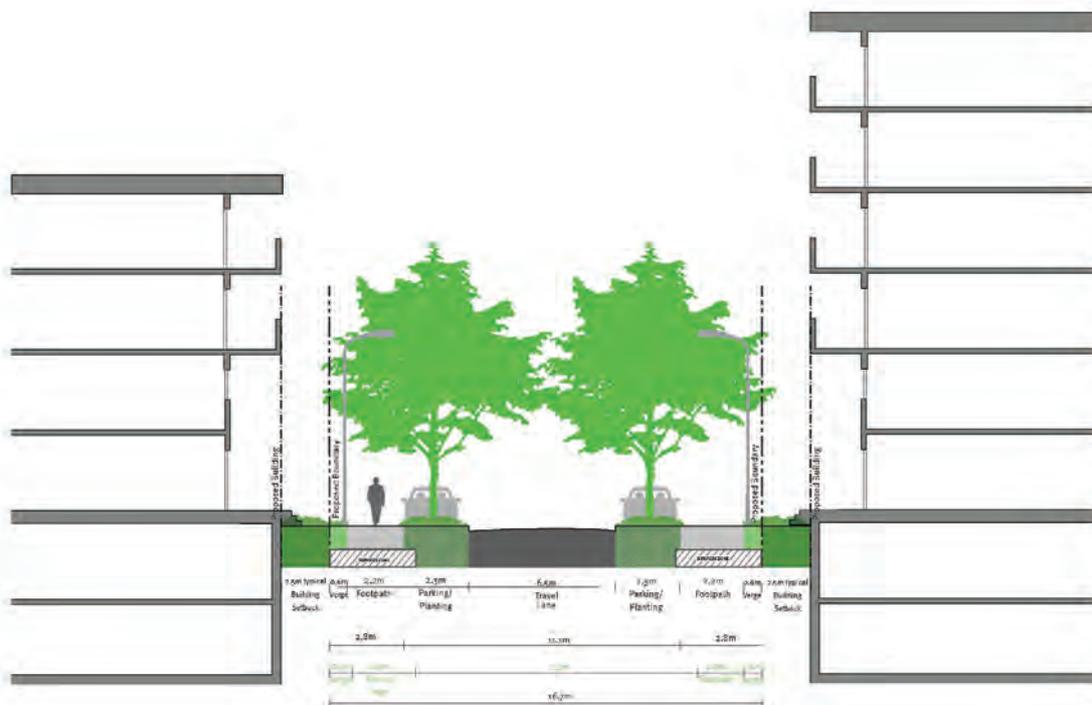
Indicative Street Section (Service Street and Local Street 16.7m)
